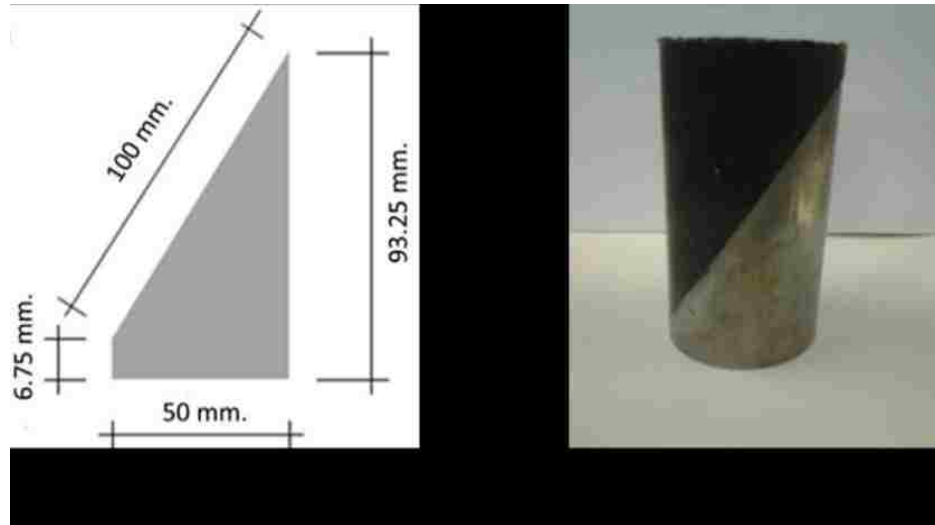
(a) Steel part dimensions (b) composite cylinder for slant shear test
